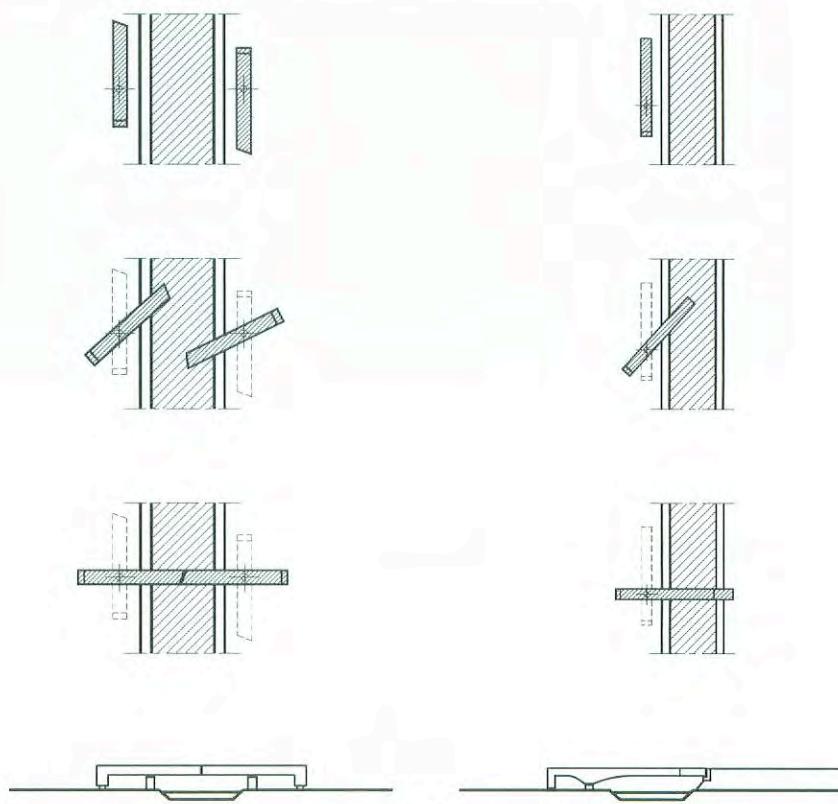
a) double rotation for a three span bridge      b) single rotation for a two span bridge
